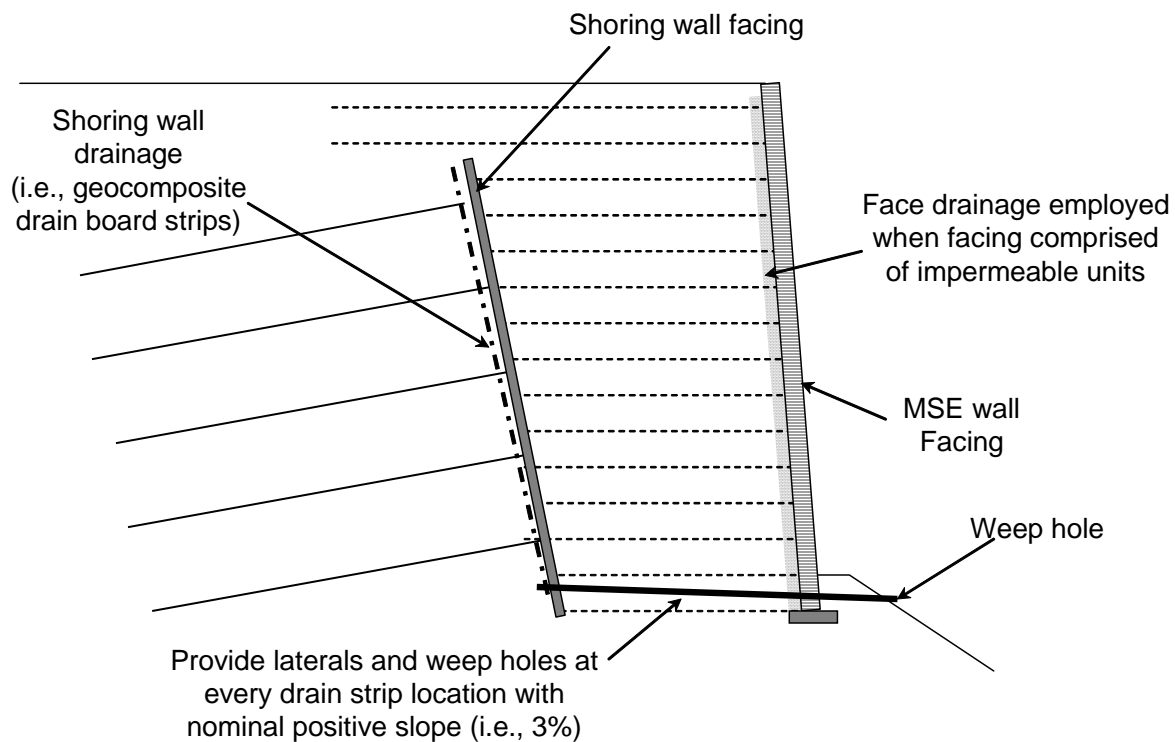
Diagram. Conceptual internal drainage for SMSE wall system.
